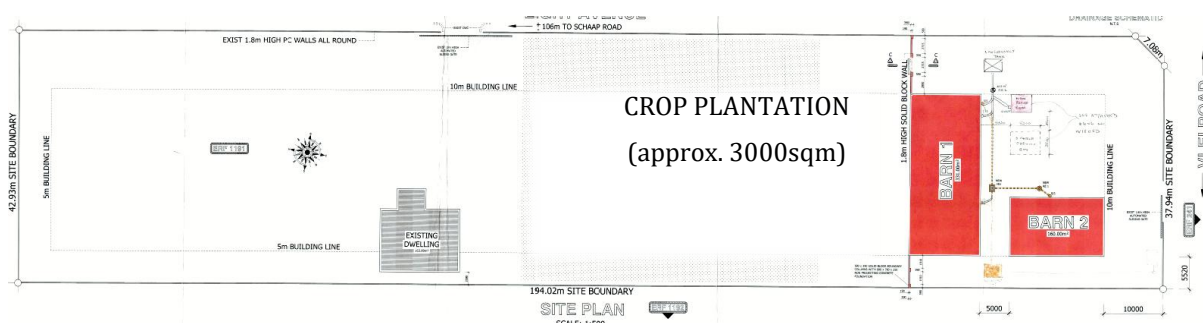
Site Plan - Extract from 2013 approved building plans
